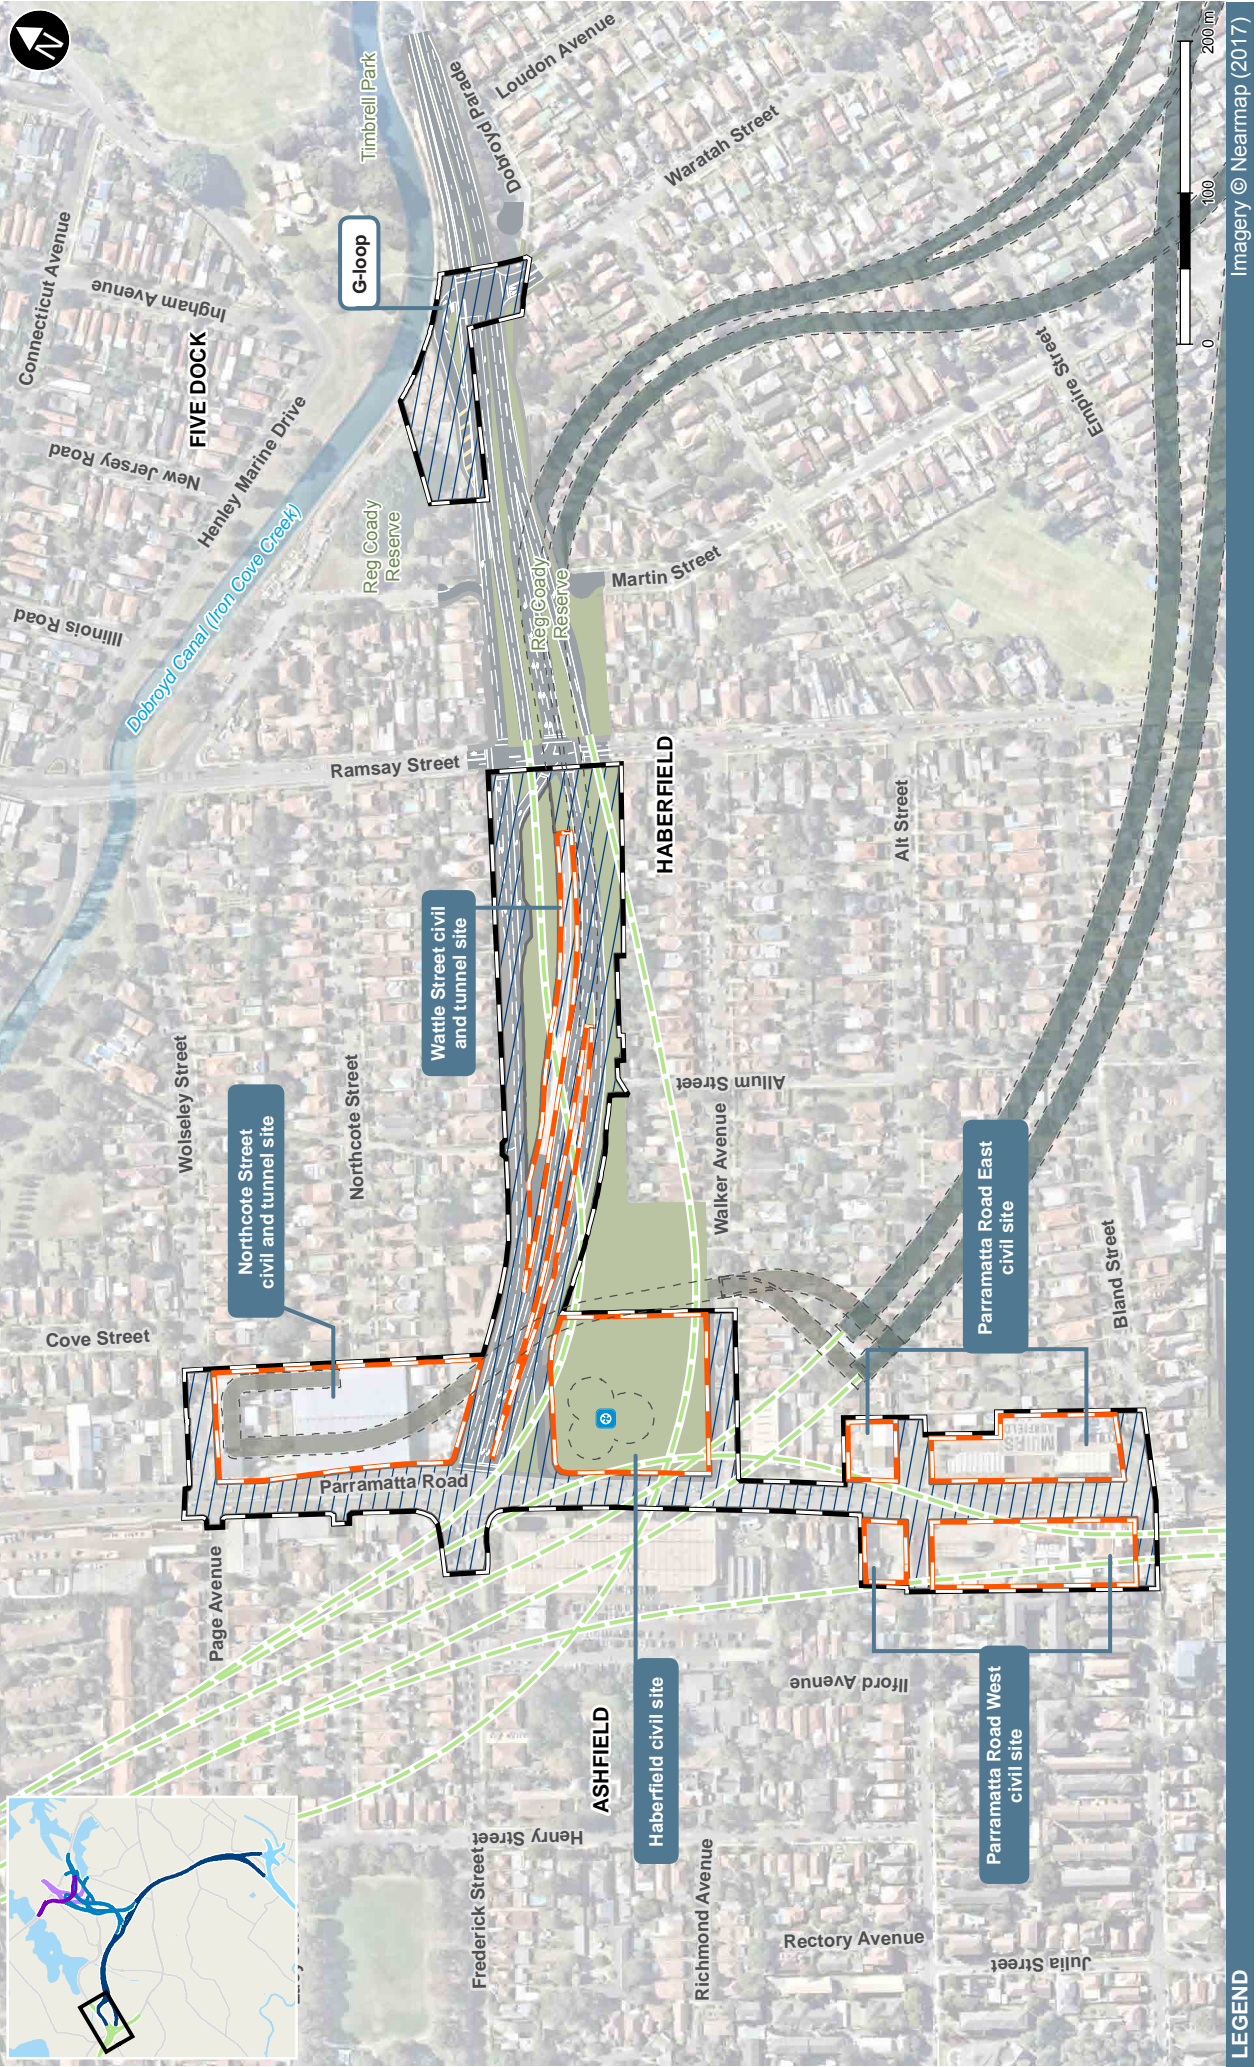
Construction project footprint at Haberfield/ Ashfield
